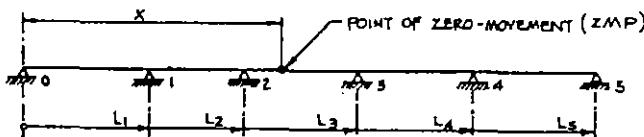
Continuous-Beam bridge deck showing point of zero longitudinal movement
